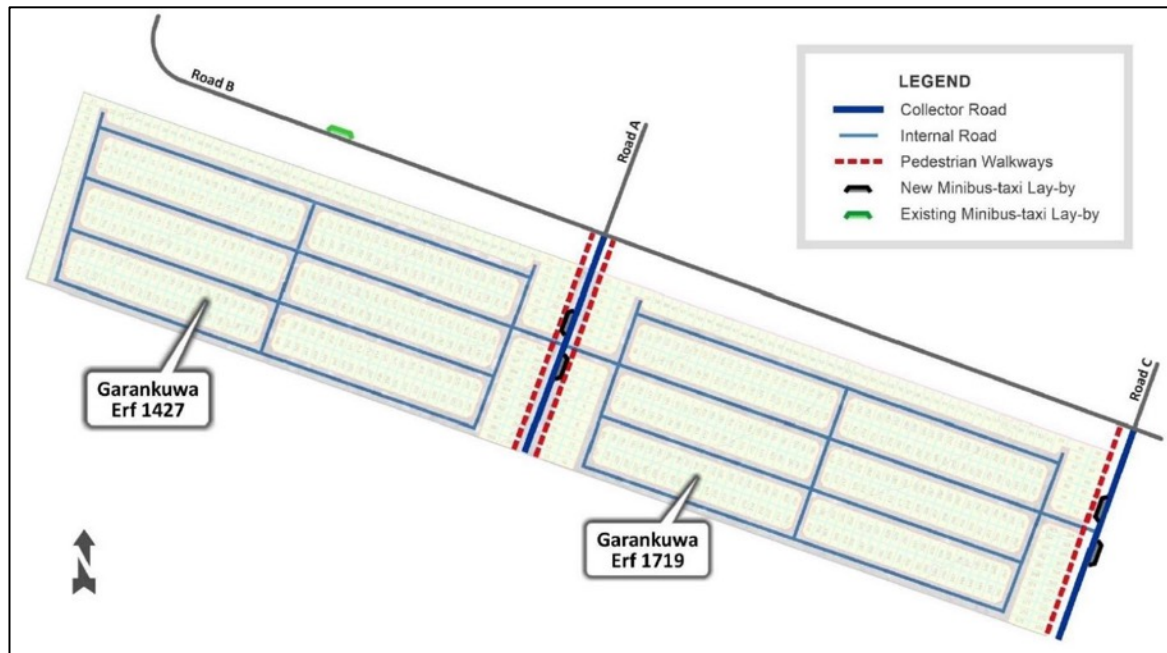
Required Road Construction including Public Transport and Pedestrian Facilities
